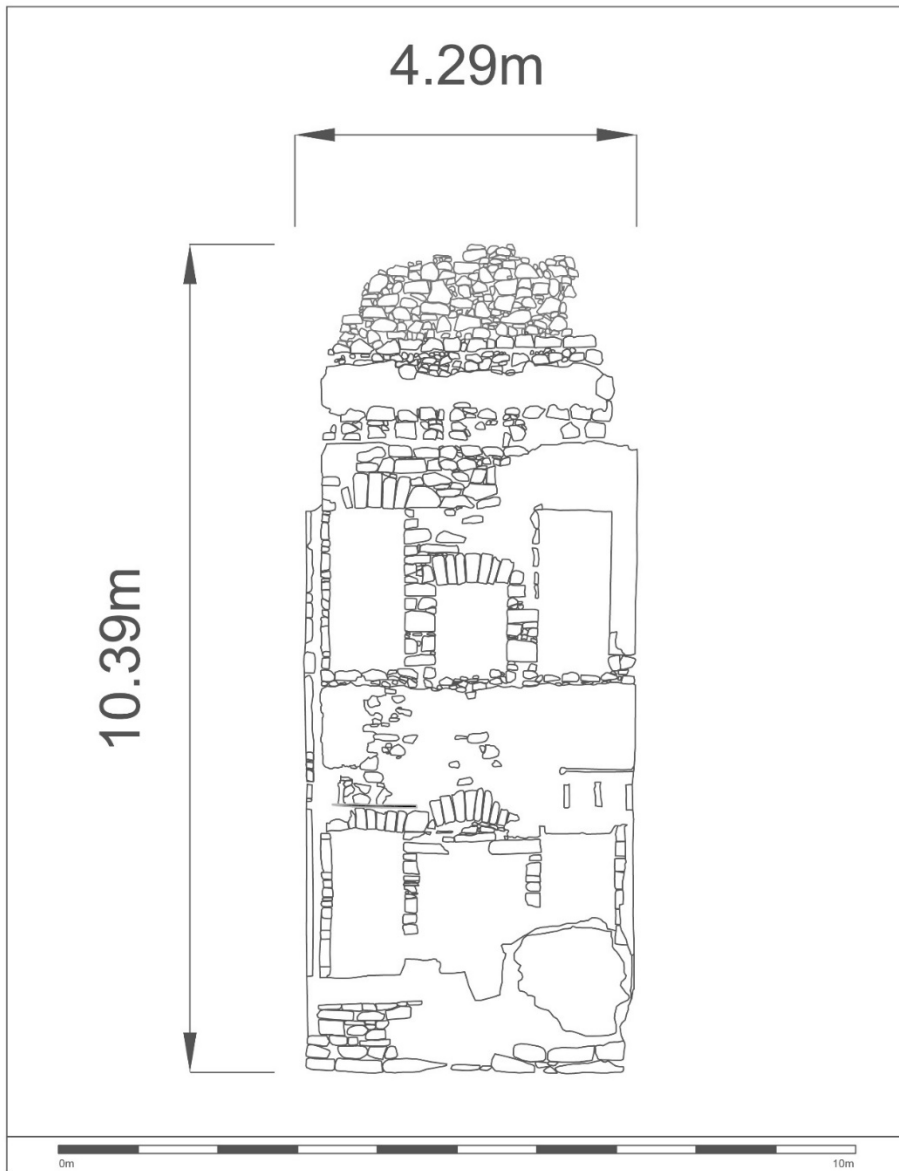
Internal elevation of the south-east wall of the signal station at Mullaghderg Hill Signal Station.
